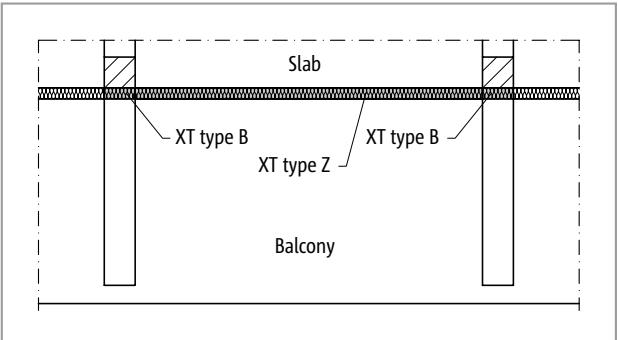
Schöck Isokorb® XT type B: Balcony construction with freely cantilevered downstand beams
